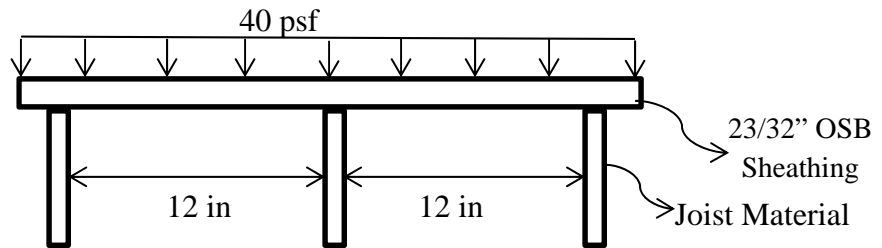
Section view of Narrow floor showing Joists, Sheathing material.
